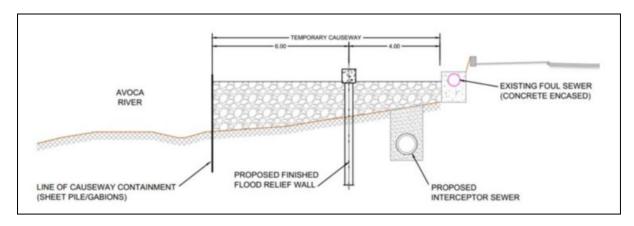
Section Through Temporary Causeway. Not to scale.
